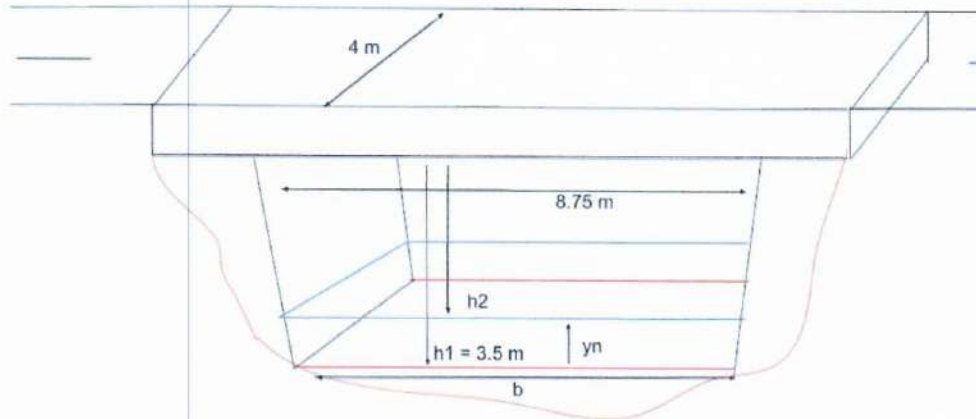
Sketch of bridge located 44 m upstream of Agatobwe weir
